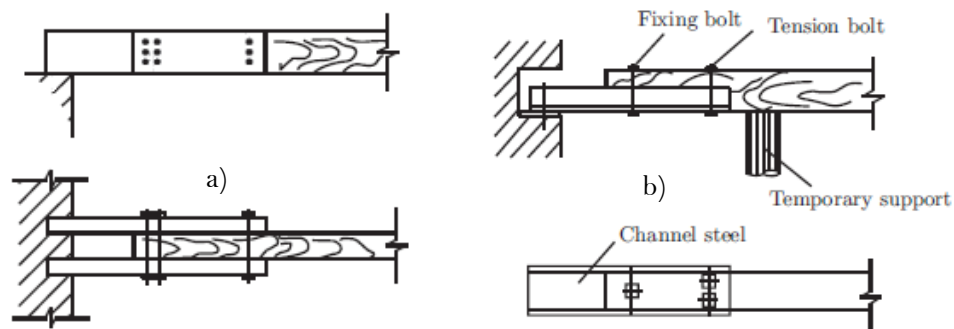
Strengthening with: a) clamped connection; b) haunched connection (Lu, 2010)
